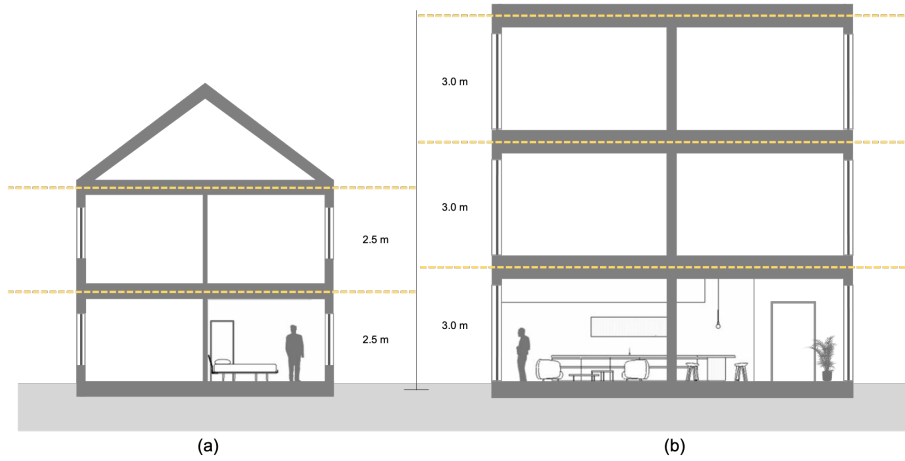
This figure shows an example of the floor-to-floor height: (a) residential building; (b) commercial building.
